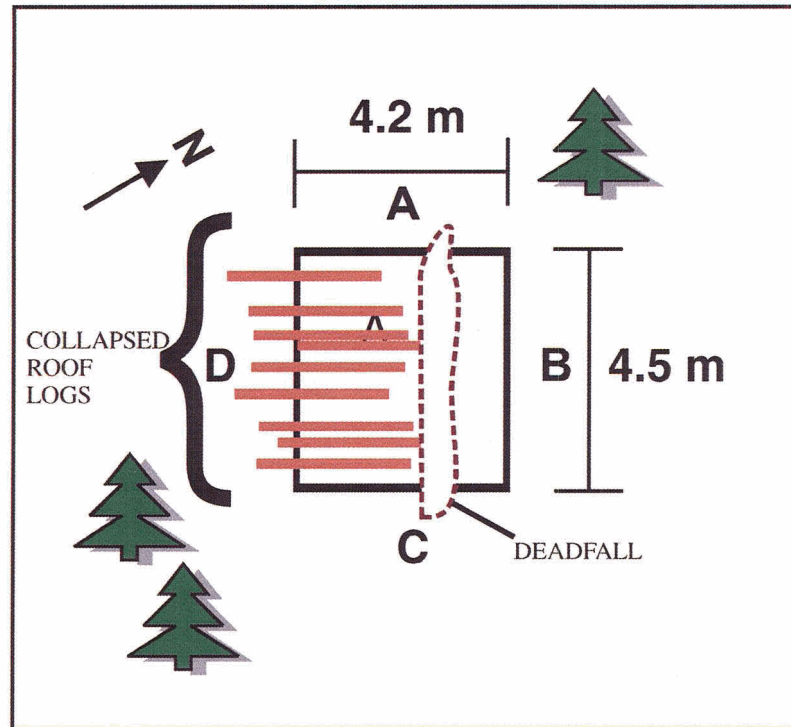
Mistaya River Cabin dimensional drawing.
